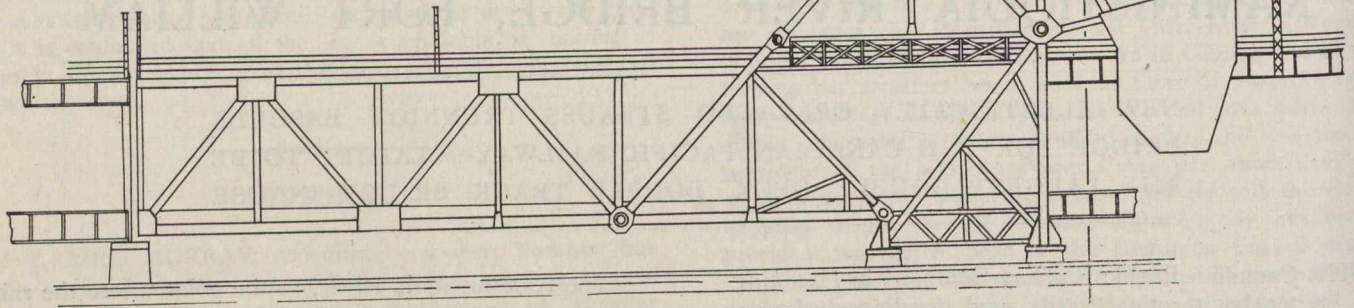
Kaministiquia River Bridge, showing General Elevation Diagram.
